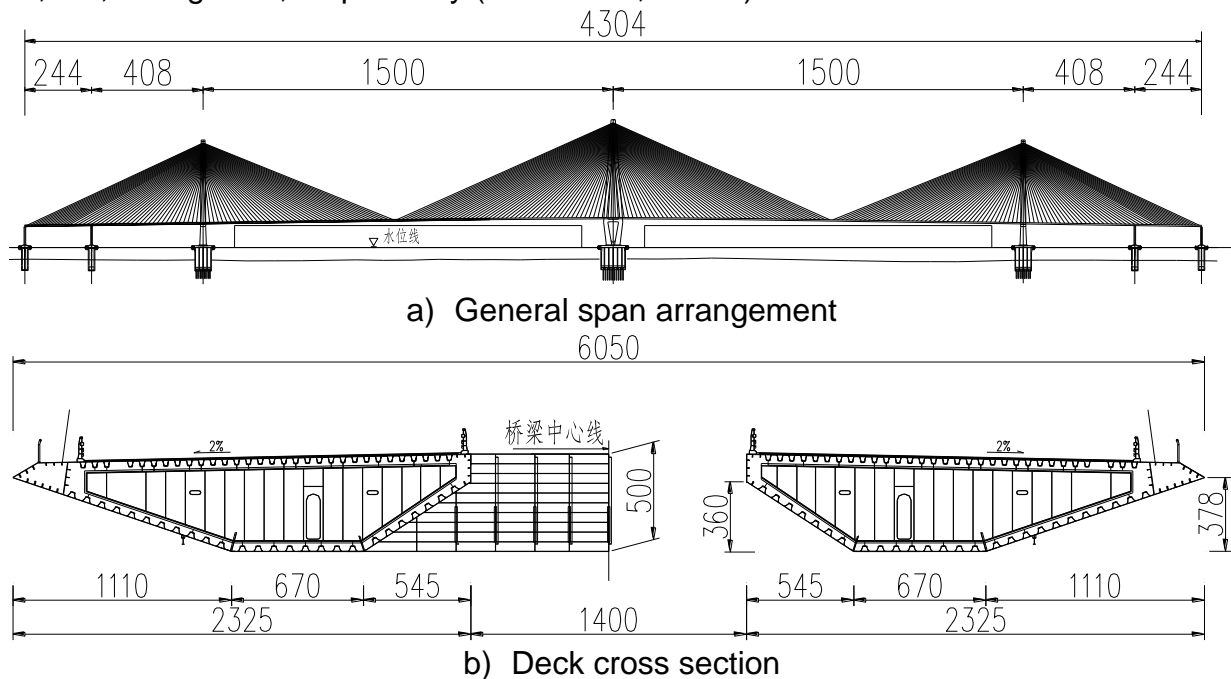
General arrangement of a double 1,500m spans cable-stayed bridge (unit: m)
